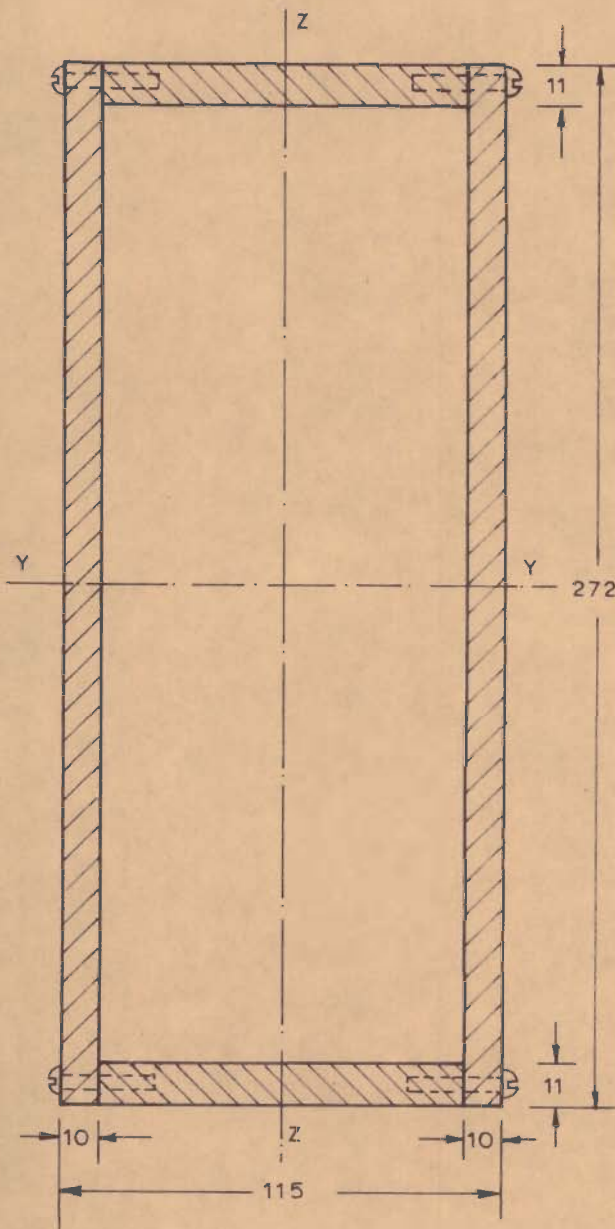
END VIEW OF MODEL BRIDGE AT TOWER LOCATION
